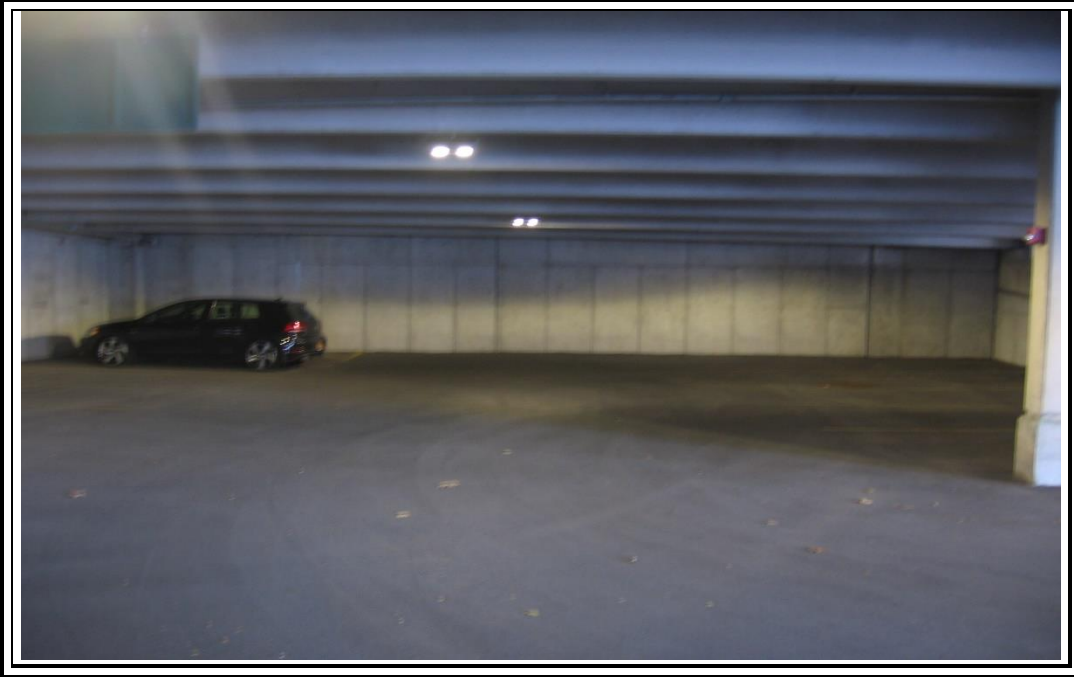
Looking west toward Howard Street; paved surface cover within lowest level of parking garage (12/3/20).
